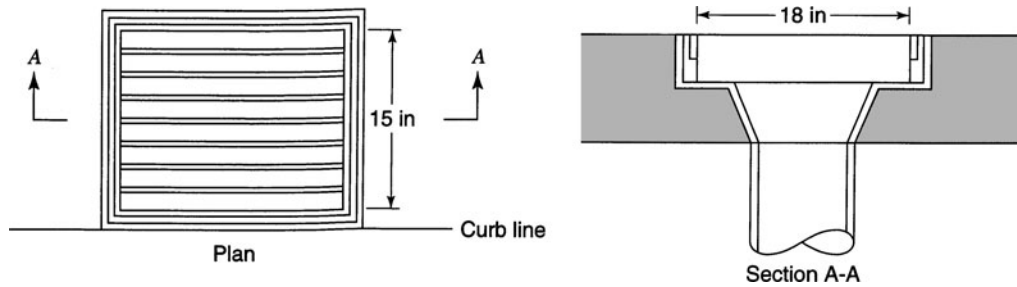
Bridge inlet (from Johnson and Chang (1984)).
